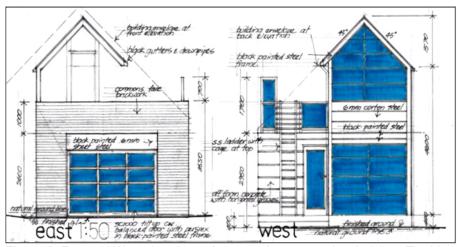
East and West elevations of proposed garage and outbuilding. The blue paneling shown on the east elevation is perspex. On the west elevation it is clear glazing, except for the 1.7m high screening on the left hand side of the ladder which is part of the obscure glazed screening wrapping around the northern side of the rooftop garden.
